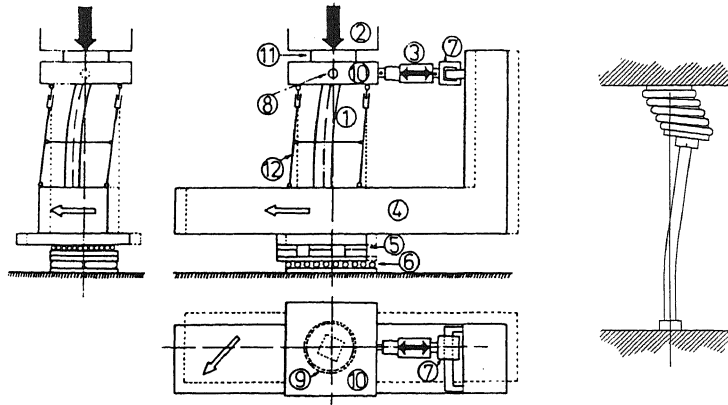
Test of Inelastic Behavior of Steel Beam-Columns of Box Section
